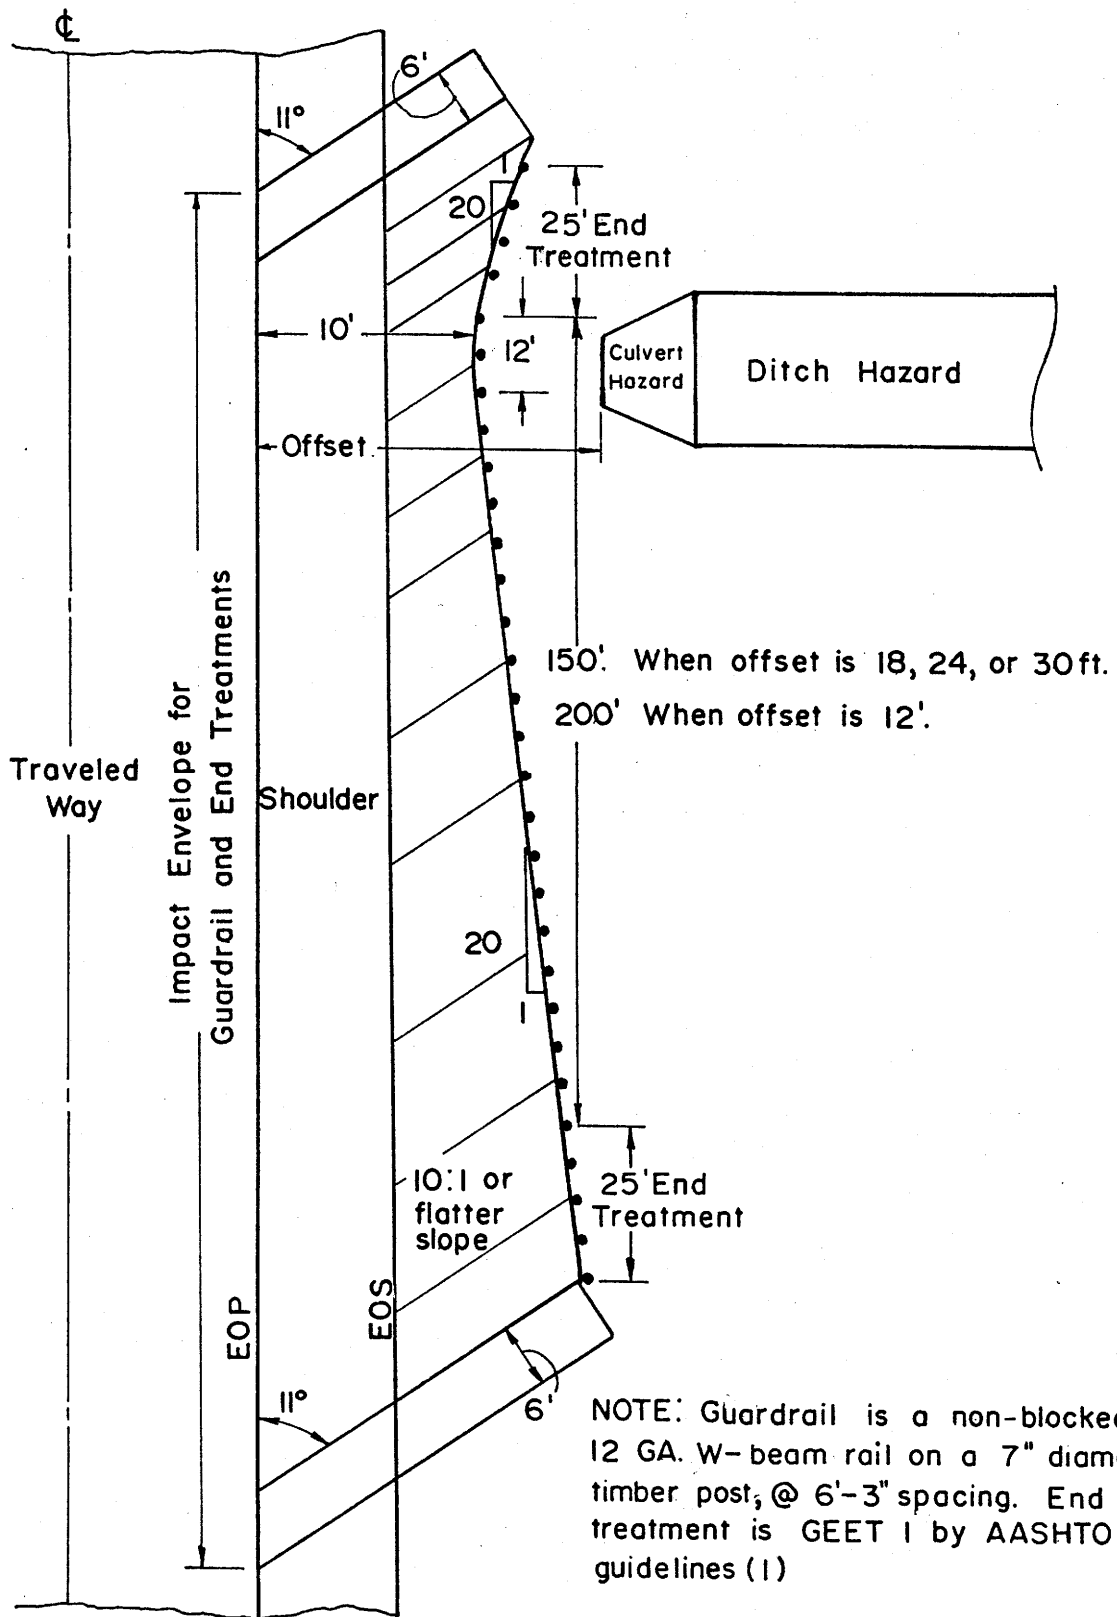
HAZARD ENVELOPE FOR GUARDRAIL PROTECTED CULVERT
